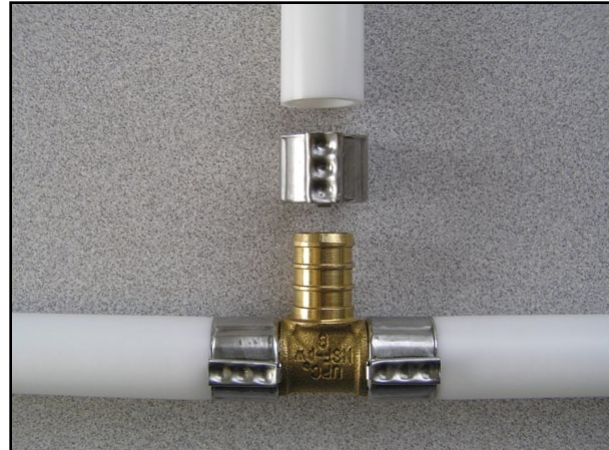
Metal Insert Fitting with Stainless Steel Clamp Sleeve
